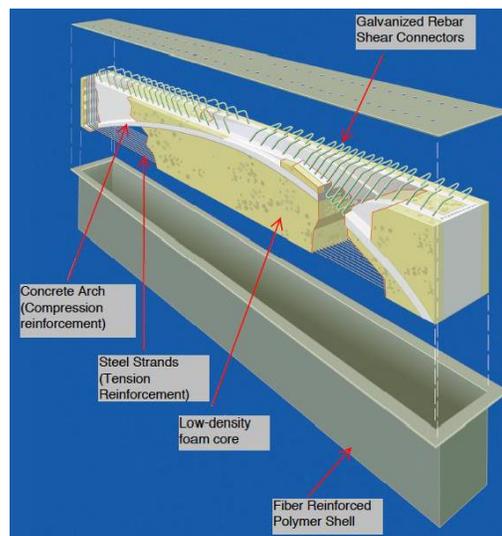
EXPLODED VIEW OF A TYPICAL HCB
